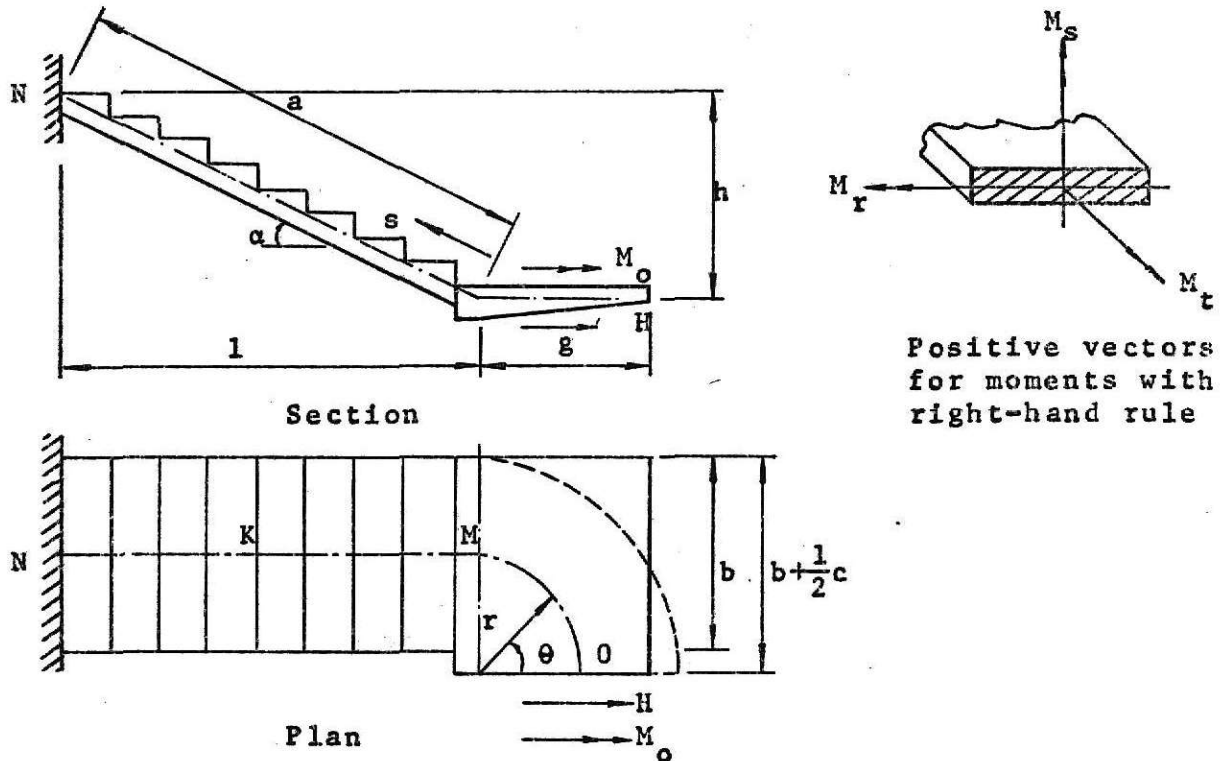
Plan, section and moment sign conventions of the half staircase
